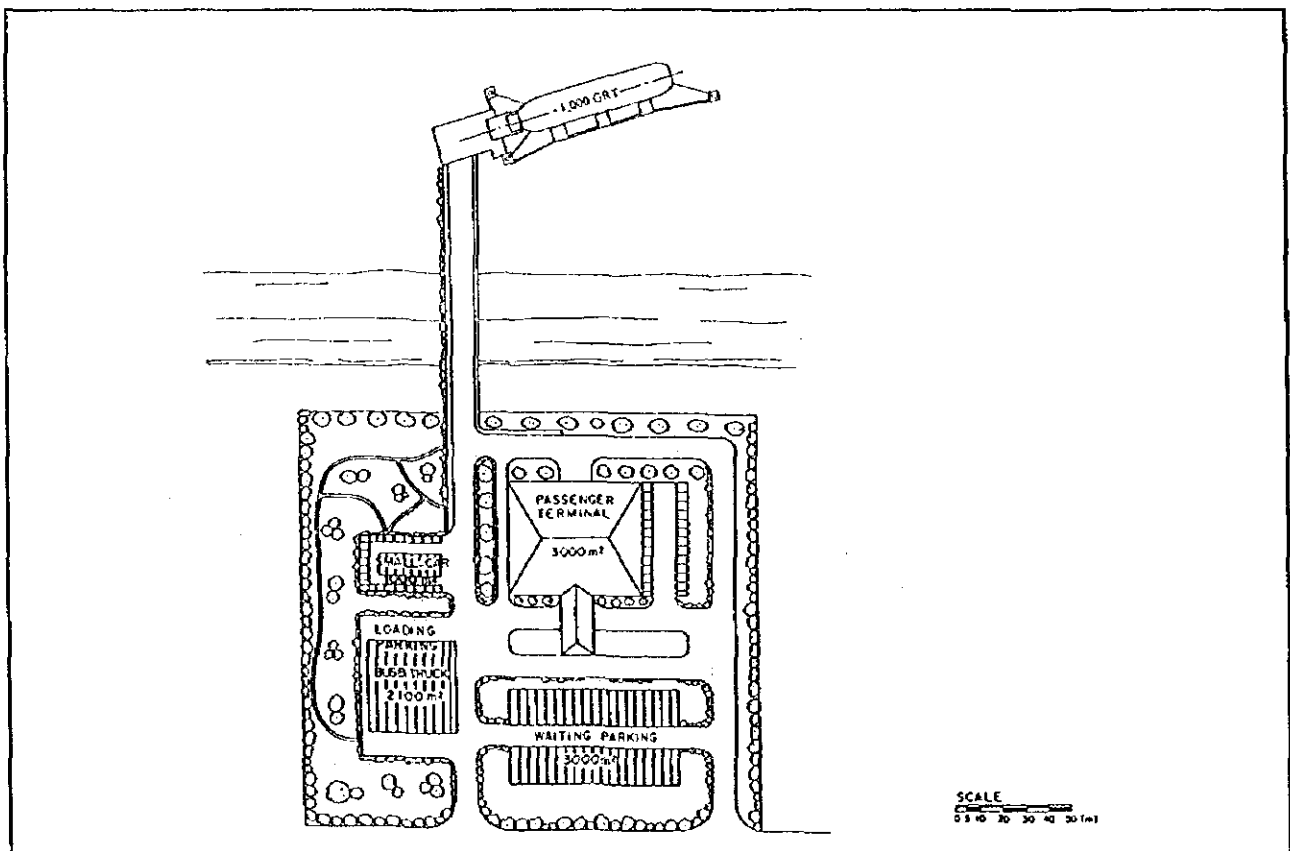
General Layout Plan of Ferry Terminal (1,000 GRT)
